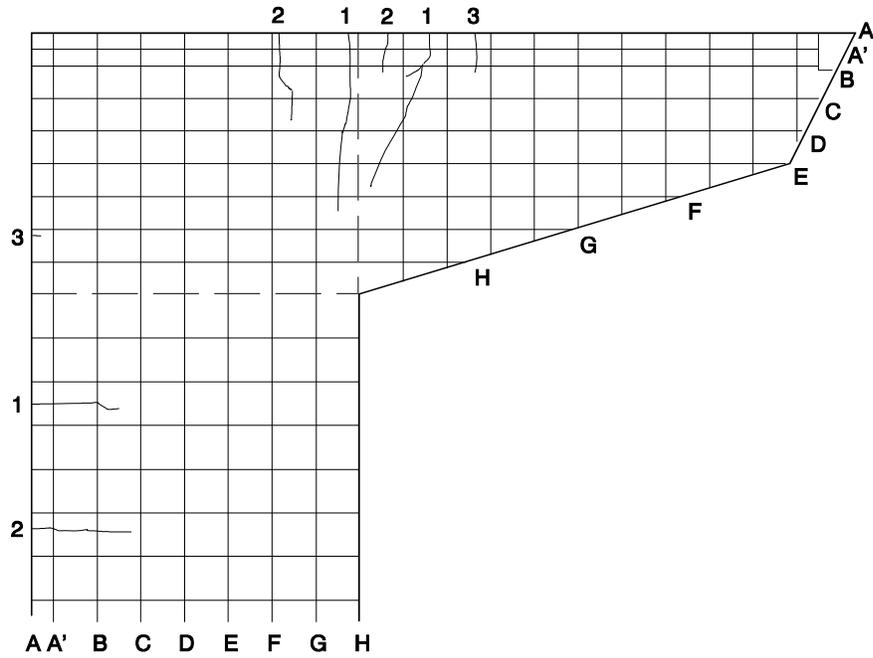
Cracking patterns on north face of Specimen POJ-PU-74-TH at service load
